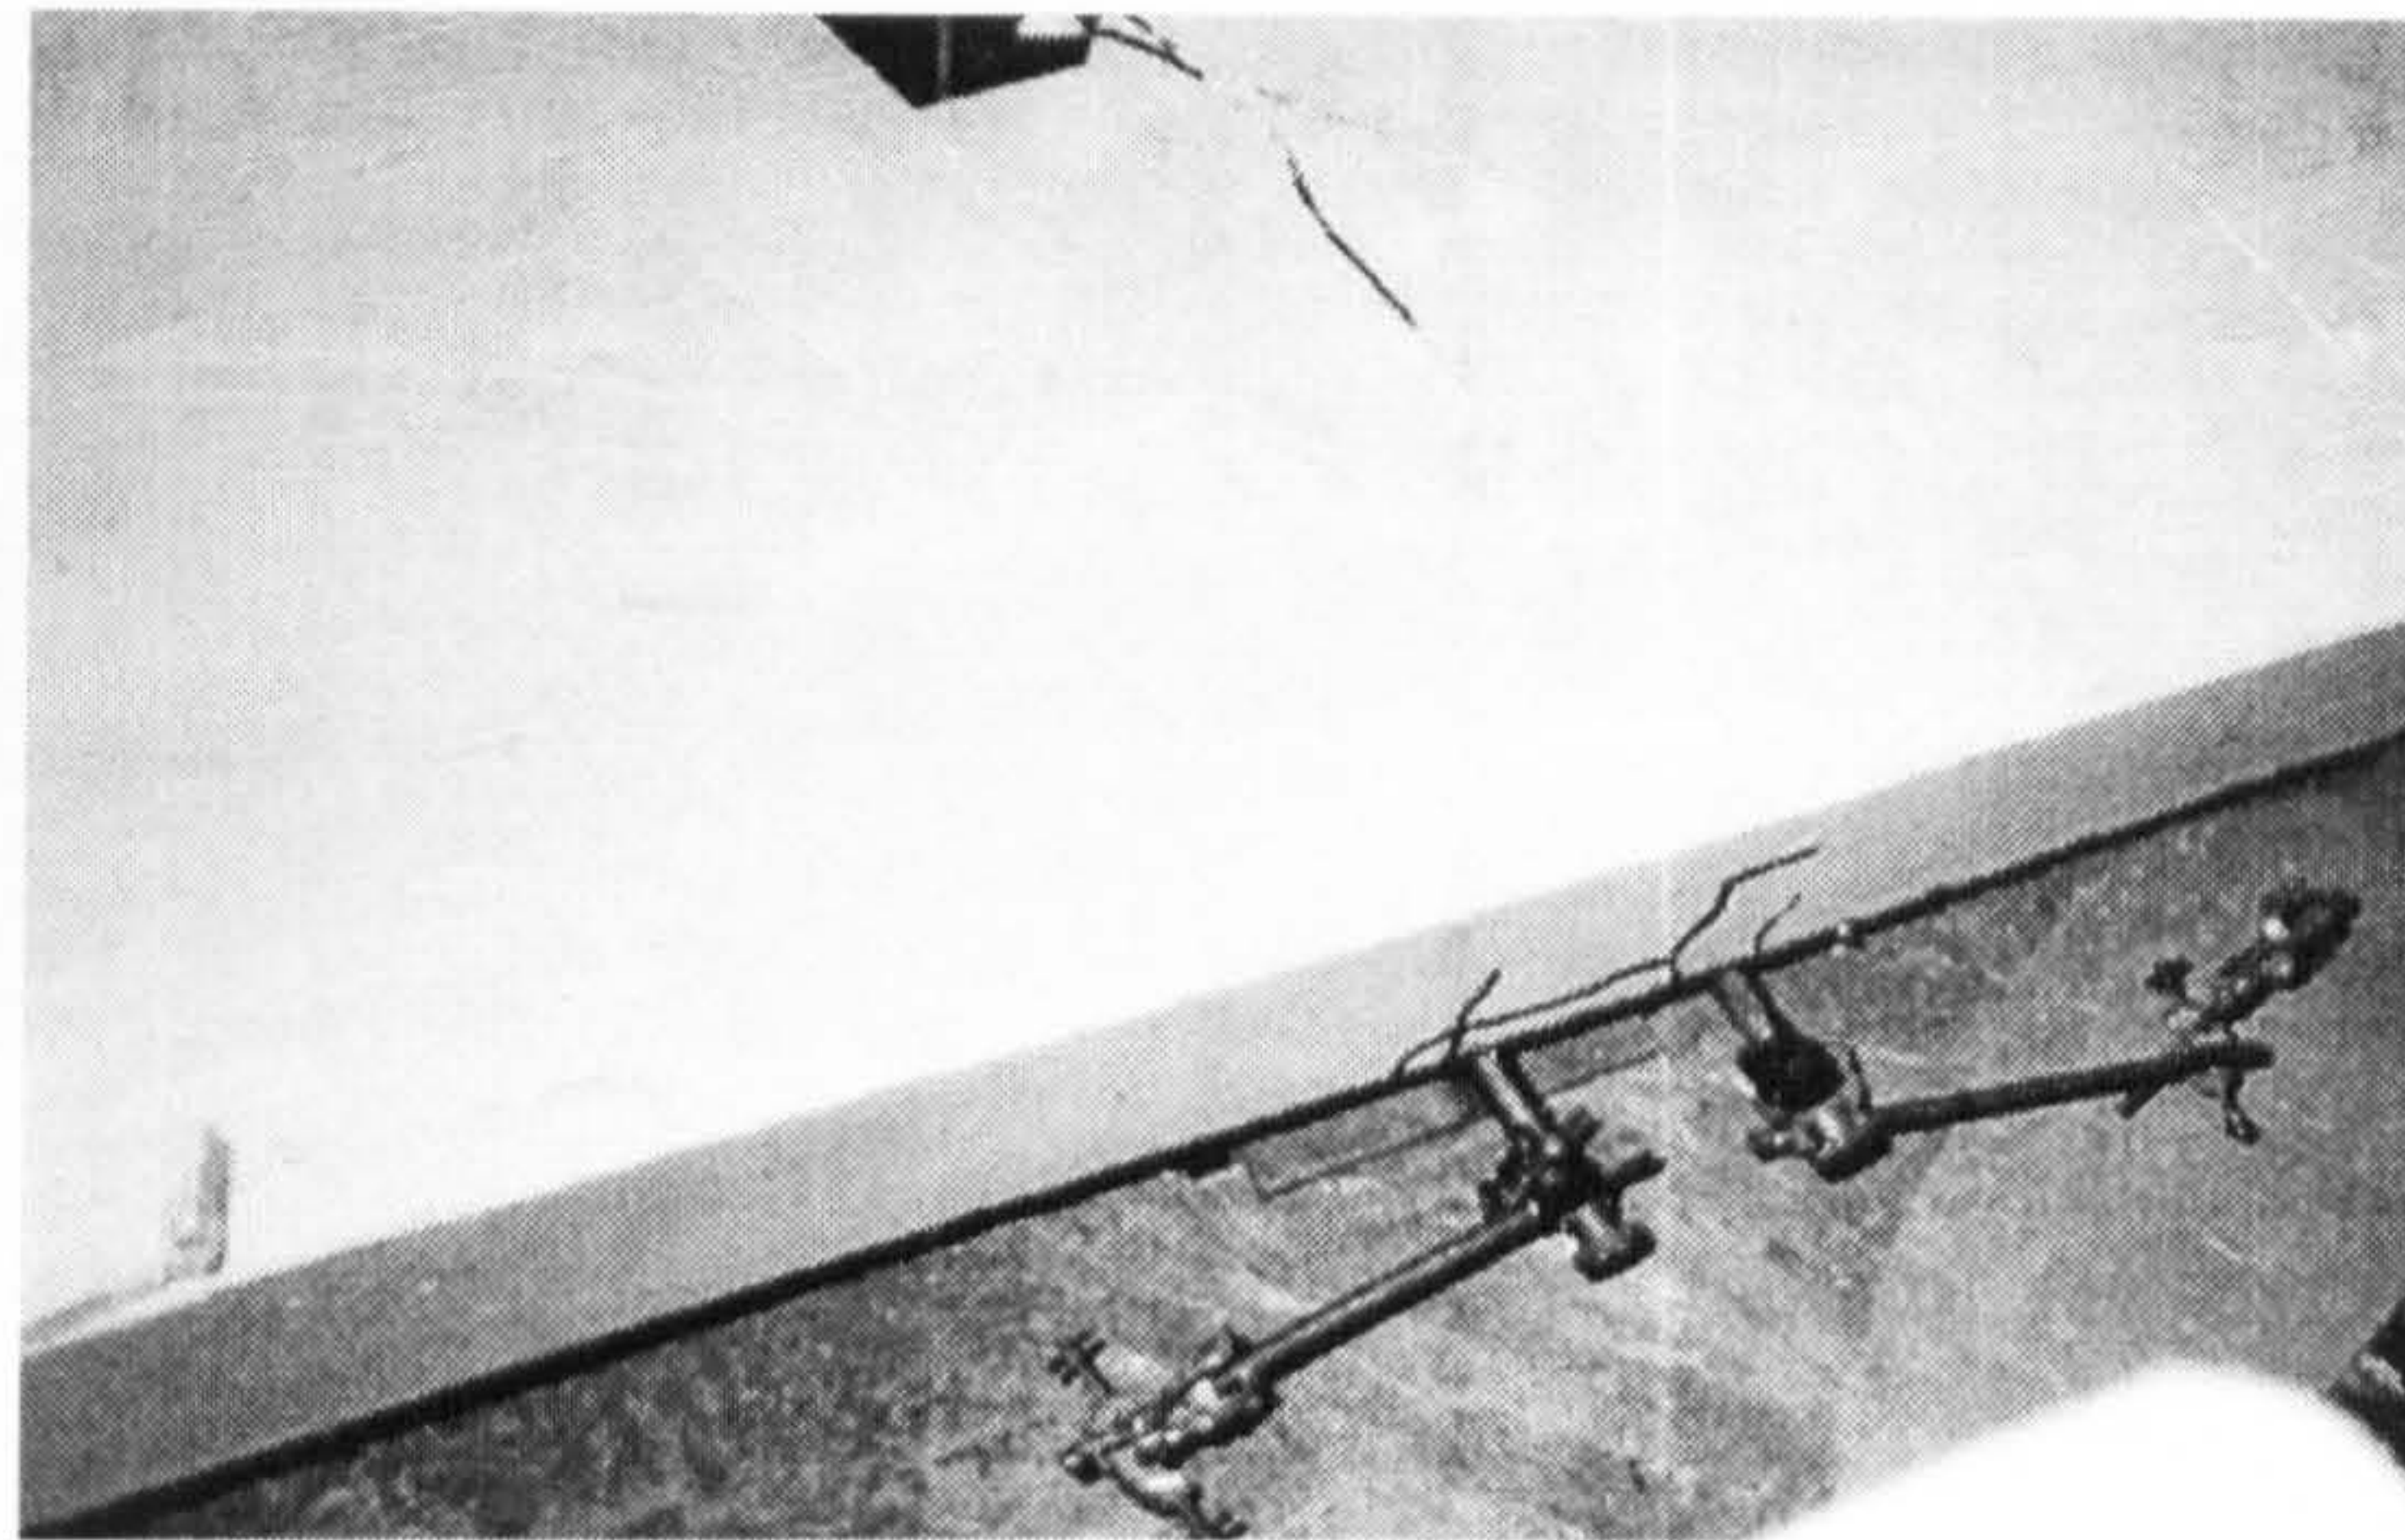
Cracks at the end of concrete slab of test specimen S1
